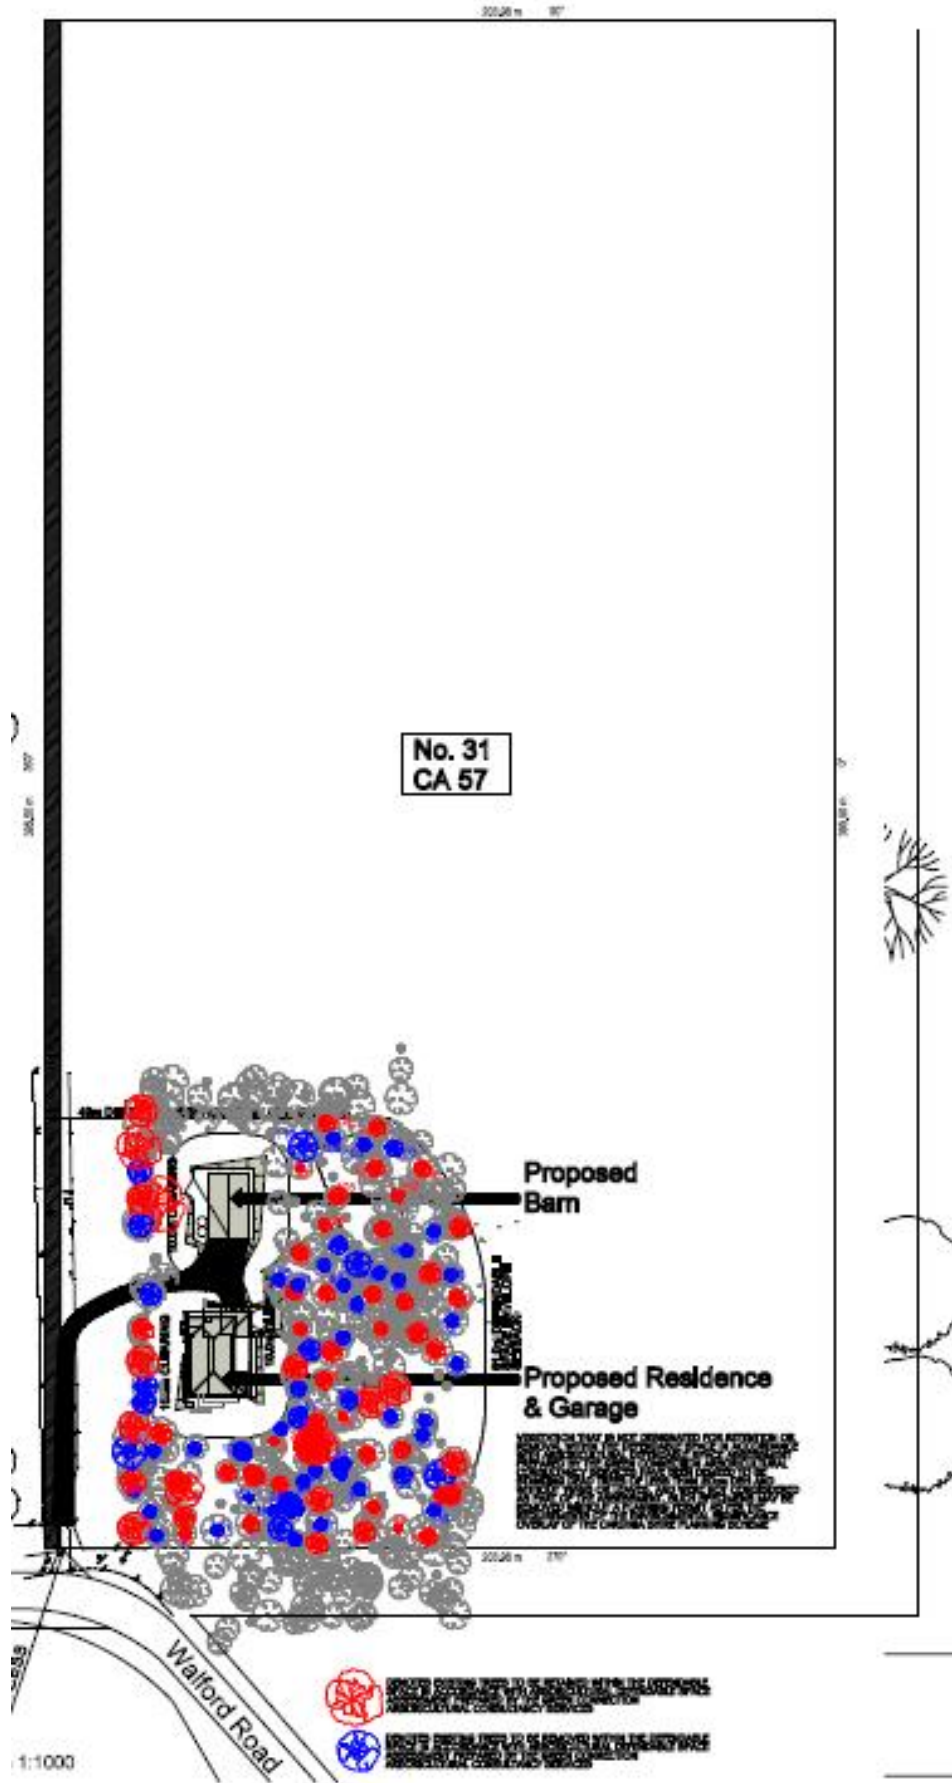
Site Plan identifying proposed development is to be located within the south-west corner of the site.
